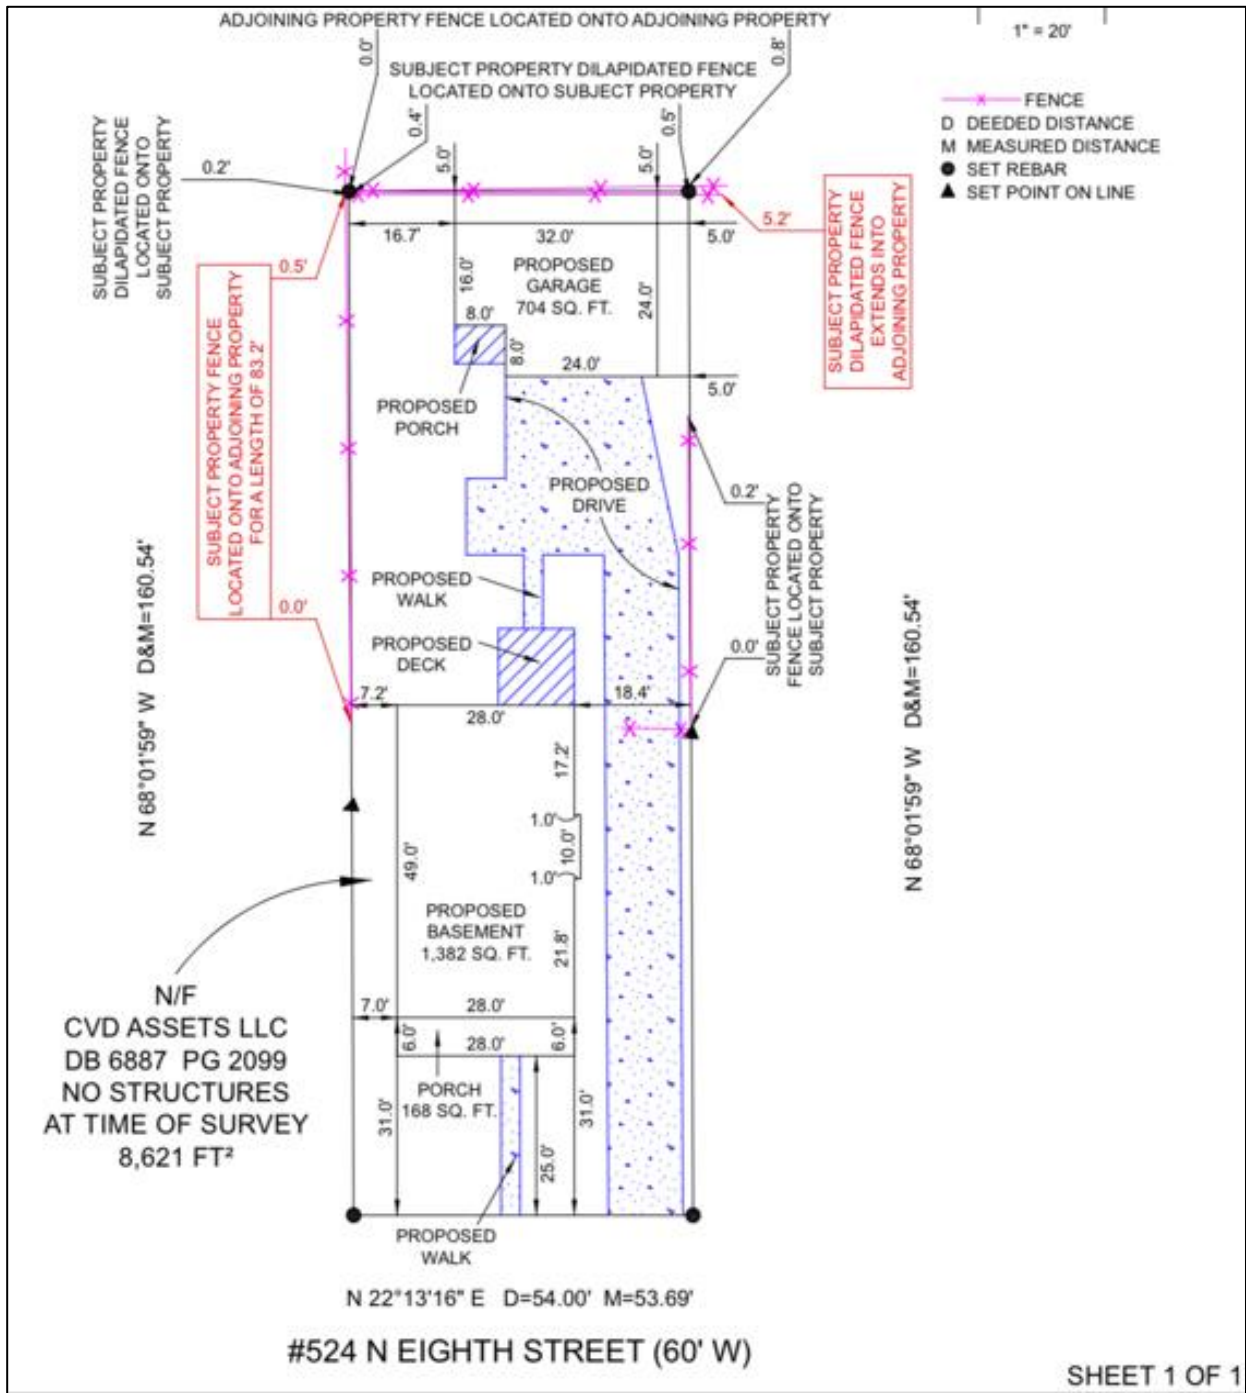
Site plan for proposed new single-family dwelling and 2-car garage.
